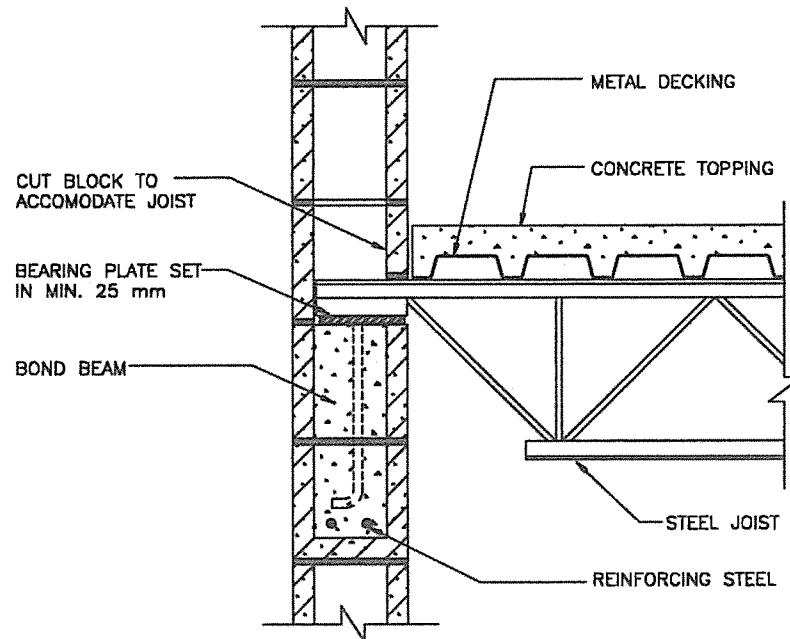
Load Bearing Masonry Wall With Steel Joists
